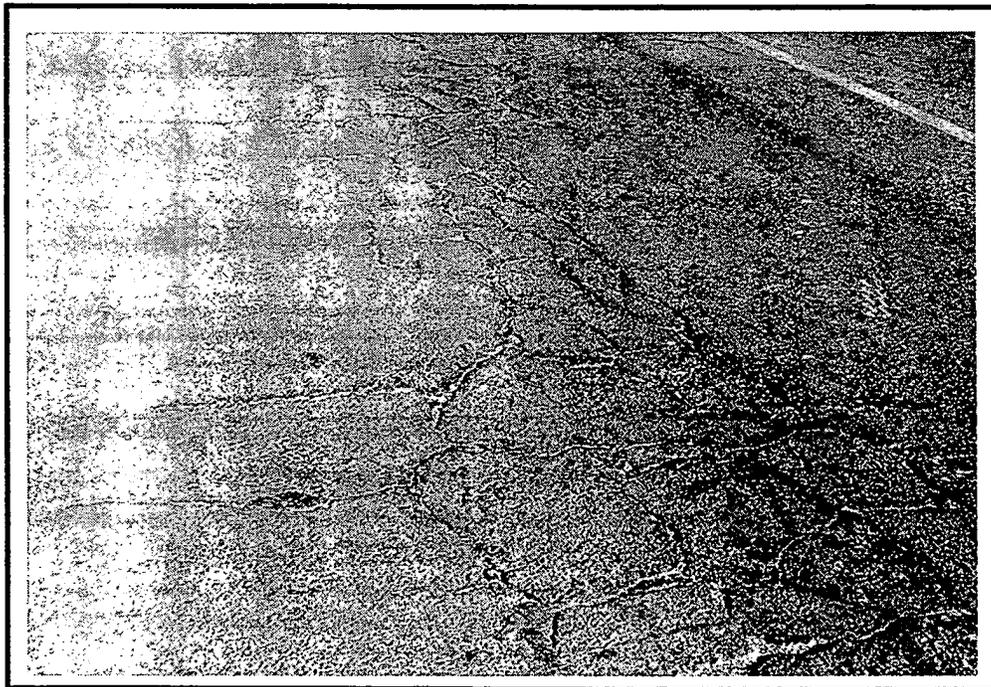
Wheel Track Cracking in Flexible Pavement, High Severity
